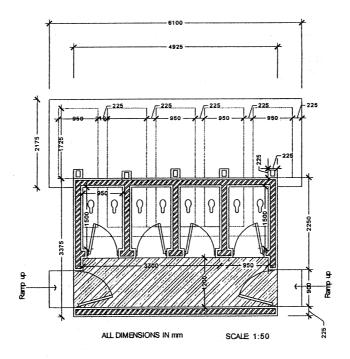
Floor Plan of the 4-compartment VIP Latrine
